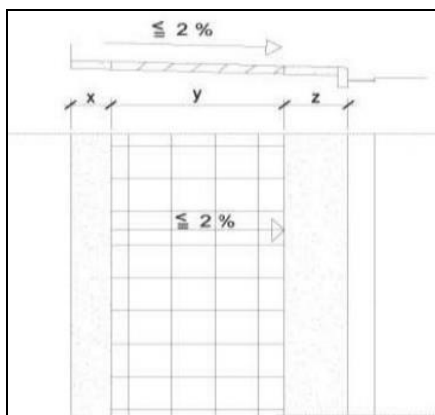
Minimum clear width of the sidewalk and safety strips (Source: ÖZİ, 2010)
